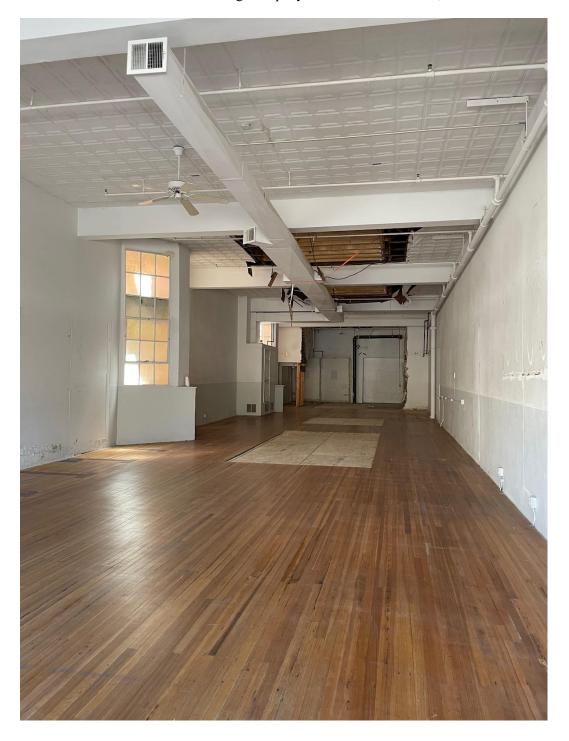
San Antonio Tent & Awning Company second floor factory space, view southeast.
